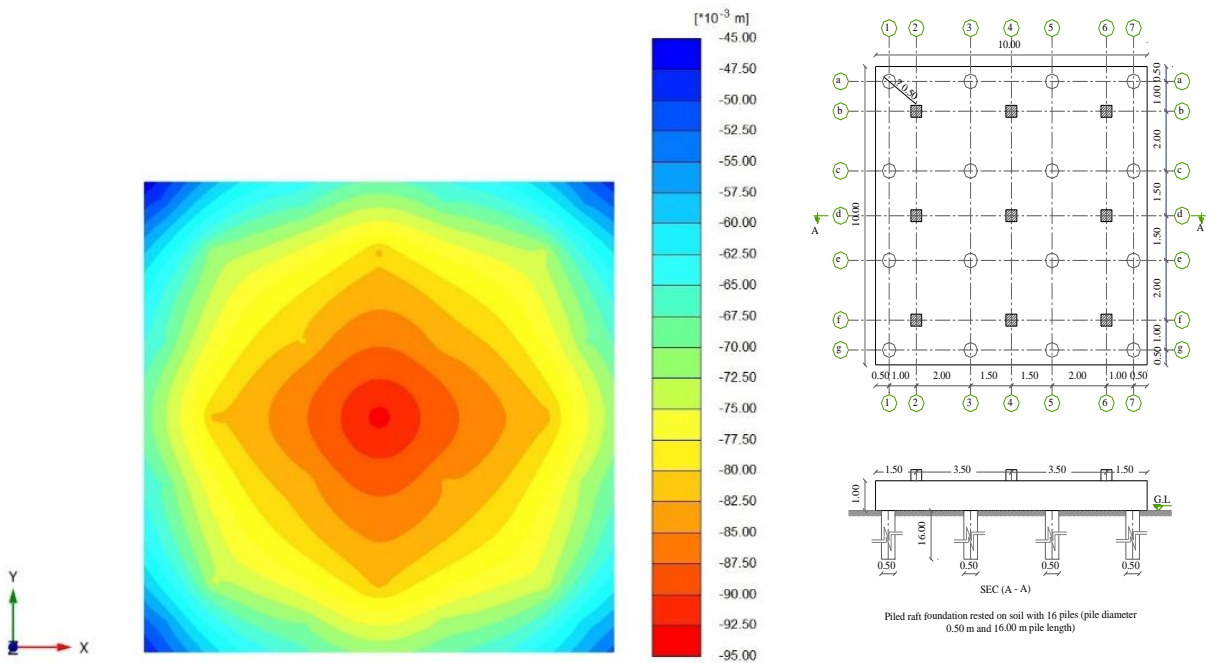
The deformed mesh of piled raft foundation rested on soil with pile diameter 0.50 m.
